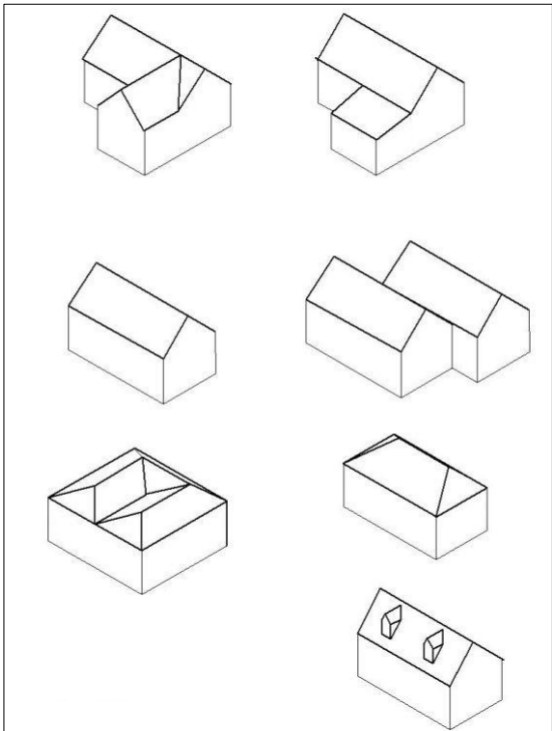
Roof forms as required by clause NOR-S8.7.2 A1
